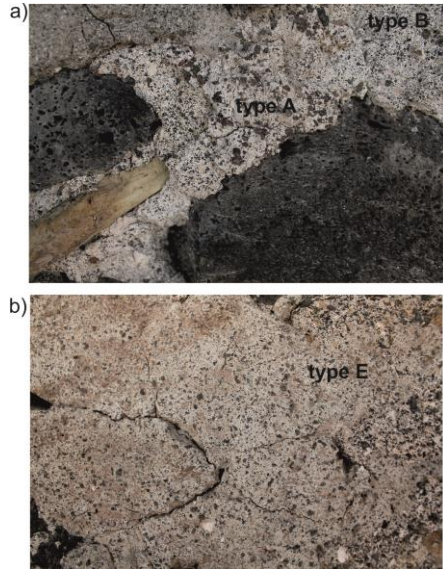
Examples of (a) type A and B plasters on first floor and (b) type E on third floor.
